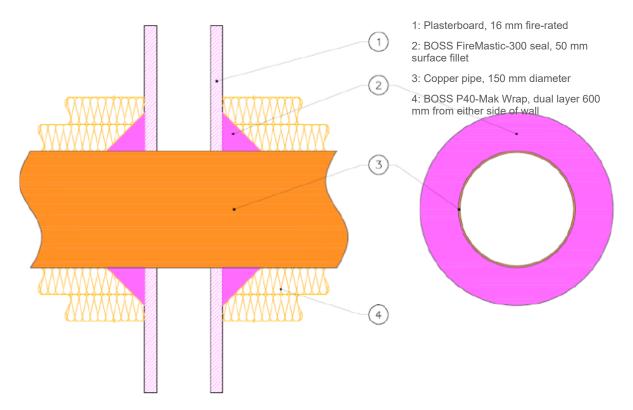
Specimen 5 in test report FSP 1833 - 150 mm OD copper pipe penetrating a plasterboard wall system
